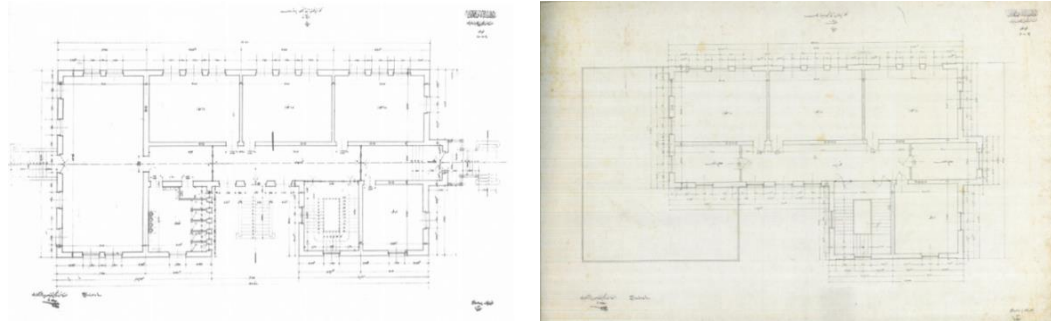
a)Göztepe Primary School Ground Floor Plan [42], b)Göztepe Primary School Second Floor Plan [51]
